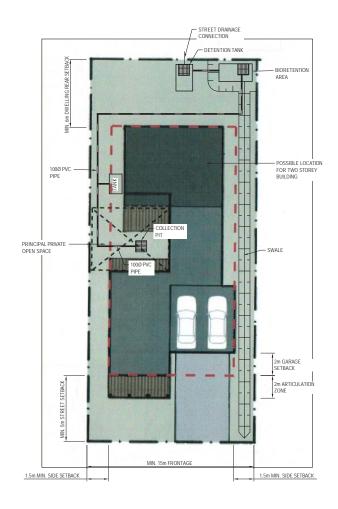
Stormwater management for a dwelling on the low side of the road
